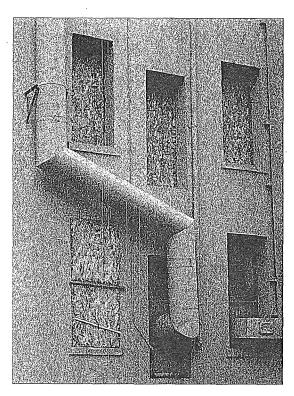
Detail photograph of ventilation ducts projecting through second floor openings. Note size difference between window and door openings (photograph taken on 01/26/2018).
